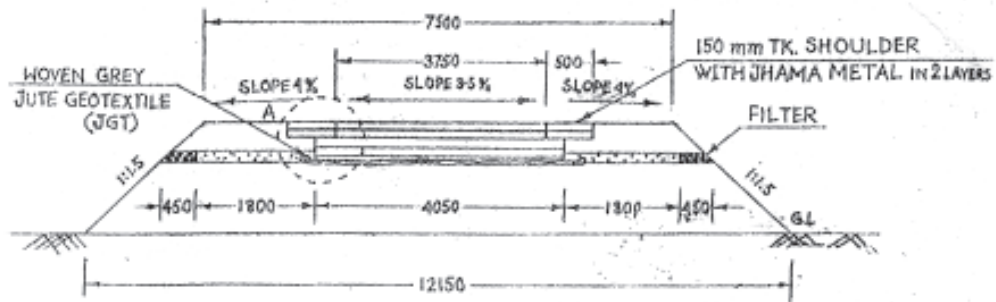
Typical cross section of road embankment using Jute Geotextile
